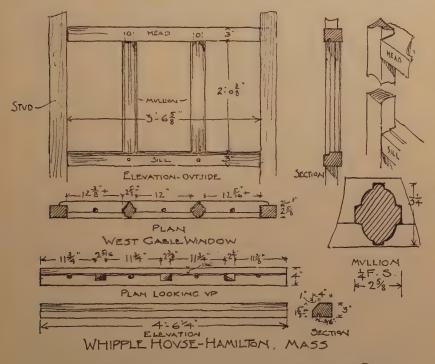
WINDOWS. OLD THREE-LIGHT FRAME IN GABLE, WHIPPLE-MATTHEWS HOUSE, HAMILTON, MASS.
